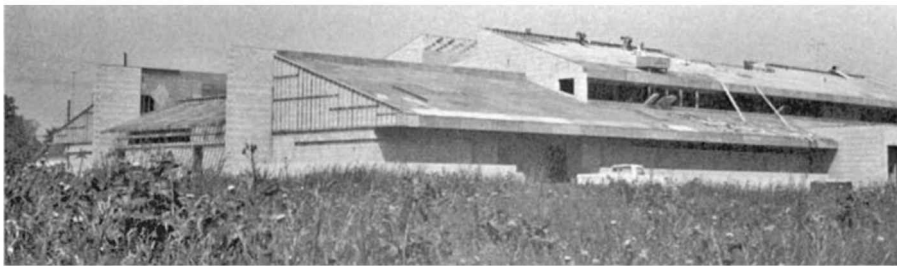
Multistory wood-frame buildings. (Photo courtesy of Southern Pine Council.)
